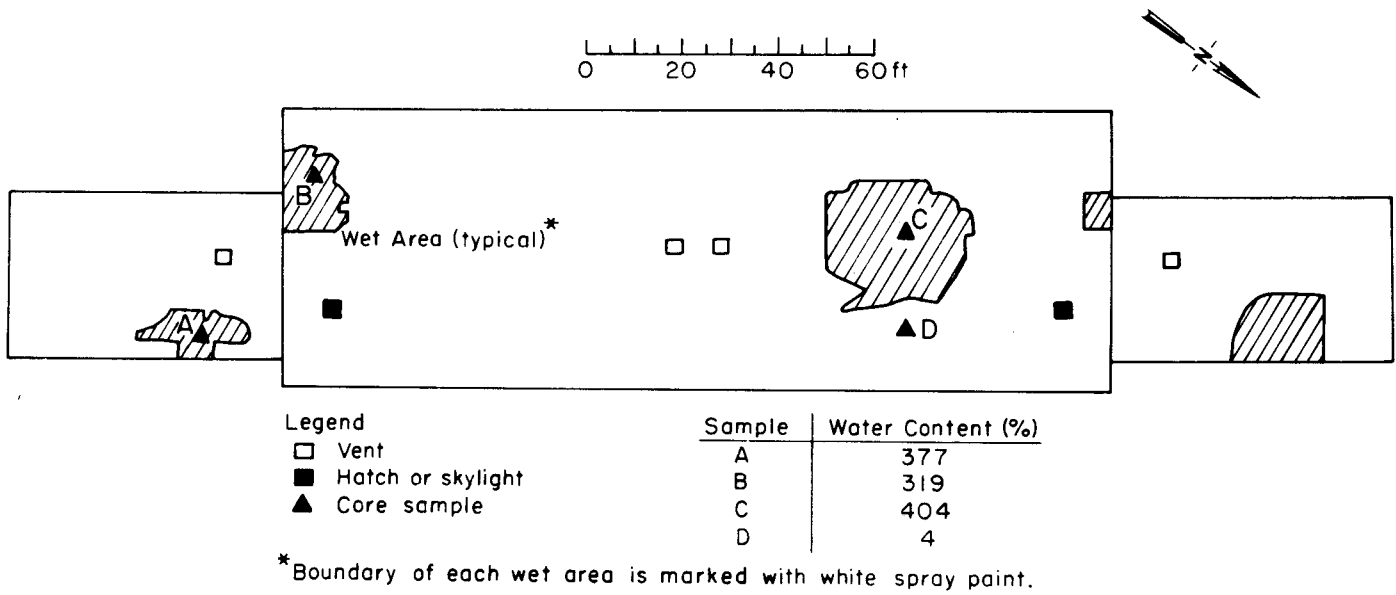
PLAN VIEW OF A ROOF AT FT. DEVENS, MASSACHUSETTS, SHOWING SAMPLE LOCATIONS AND WET AREAS.
